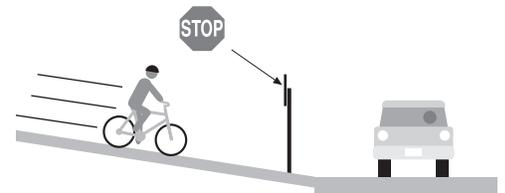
Path roadway intersections should not be placed at the bottom of a grade.
